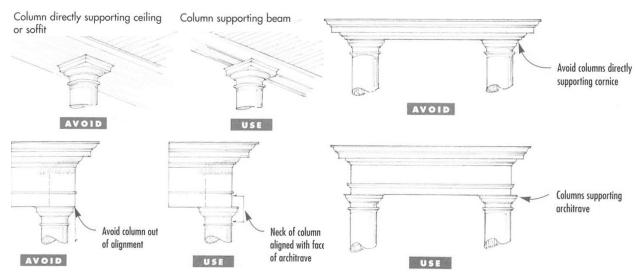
Column Alignment. Marianne Cusato, Get Your House Right (Canada: Sterling, 2007), 52, fig. 3.23.
